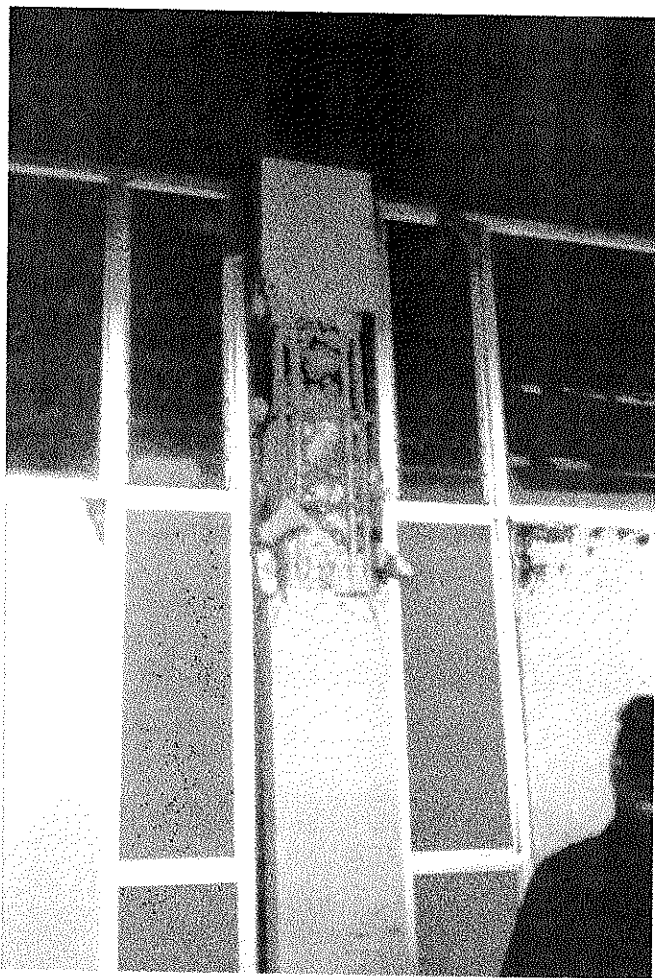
Damaged column was restrained by adjacent walls so that it acted as a short column. Post Unsafe.
